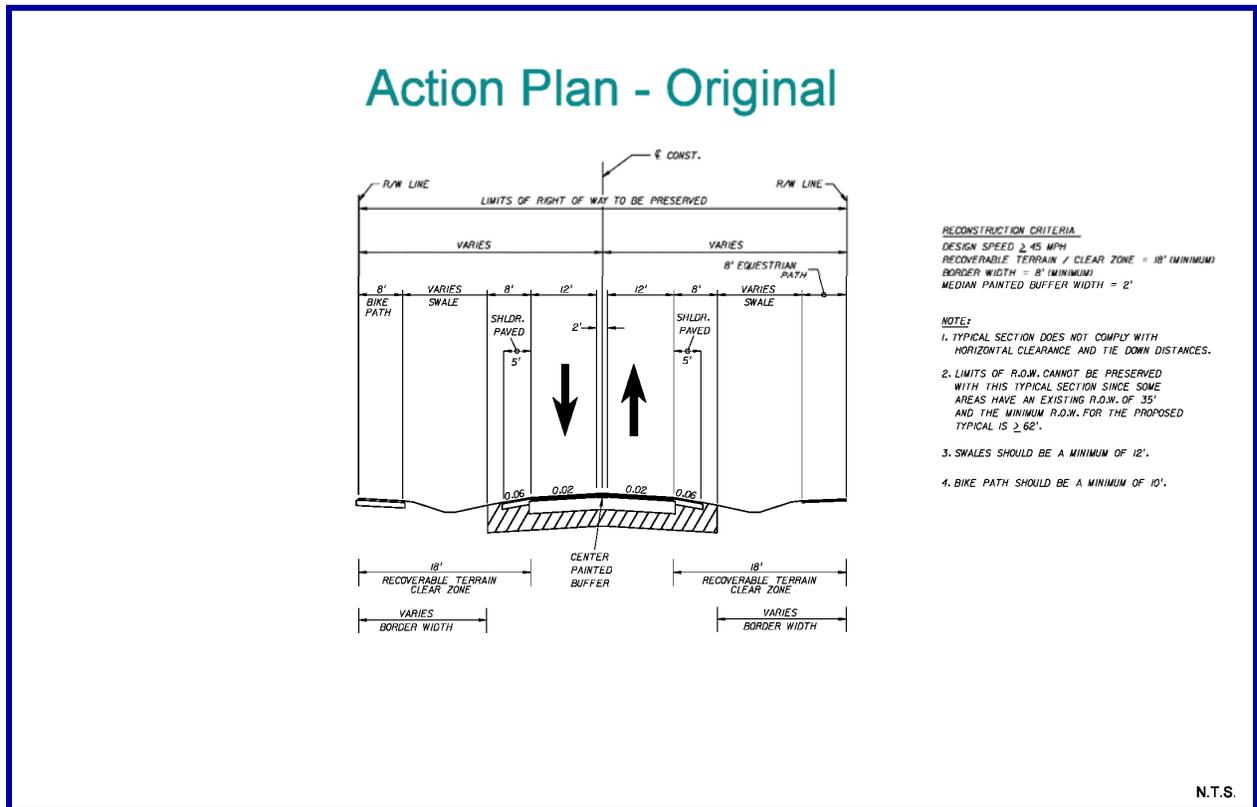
Action Plan (Original) Proposed Typical Roadway Section
